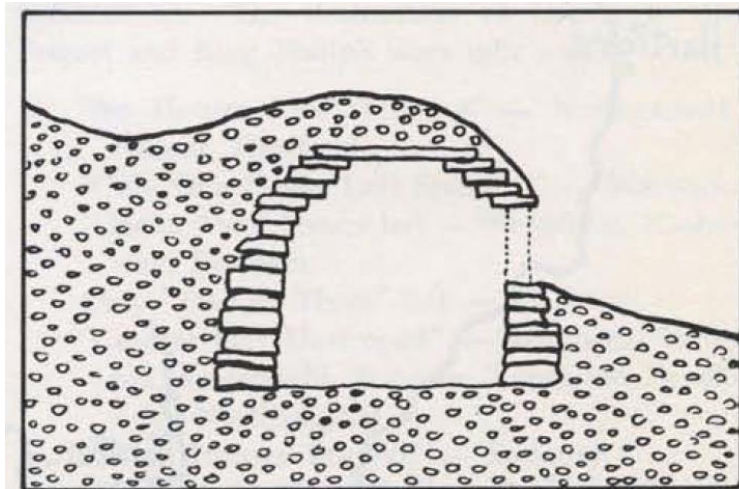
CROSS SECTION OF BEEHIVE, showing opening, corbelling, slope of ground, and hummock.
